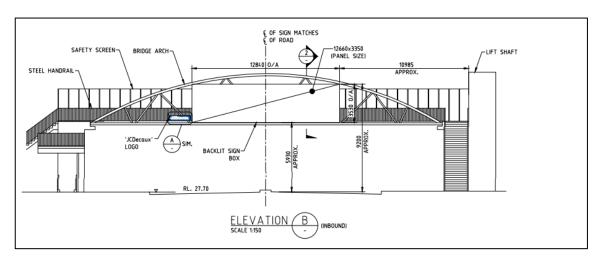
| Sign elevation – west (Source: Revised architectural drawings 23/10/24)
